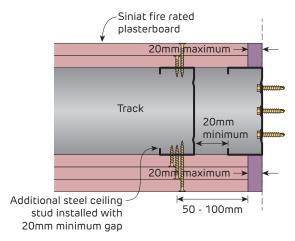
Sliding Connection EC4 Universal Bracket (UB60 or UB80) Section
